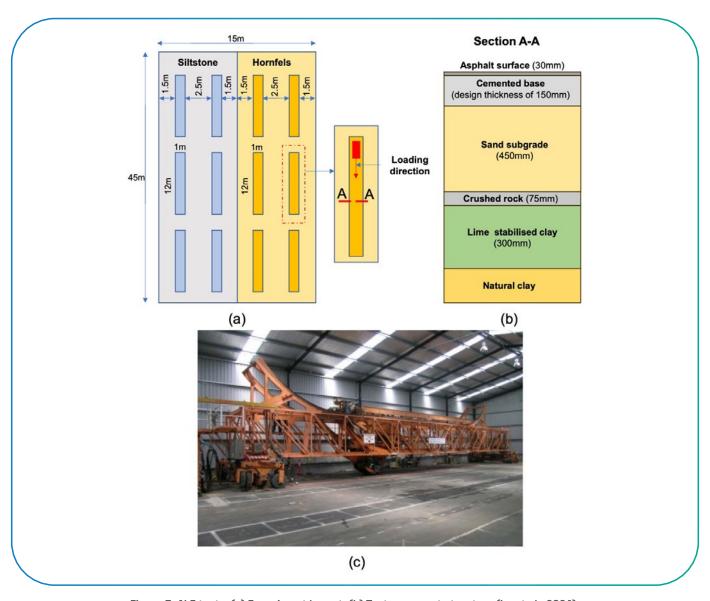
ALF tests: (a) Experiment layout; (b) Test pavement structure (Le et al., 2024); (c) The Australian ALF operating indoors at Dandenong, Victoria (Austroads, 2008b)
